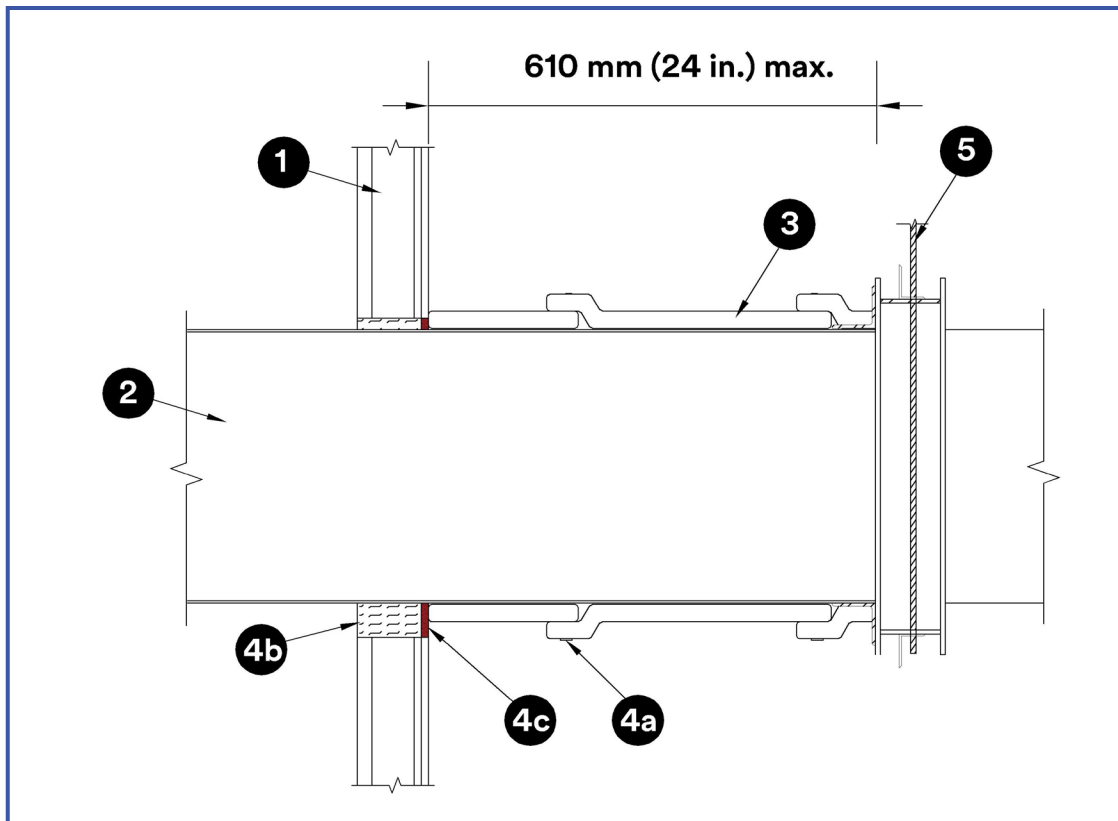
3M™ Fire Barrier Duct Wrap 615+ installation to a damper
